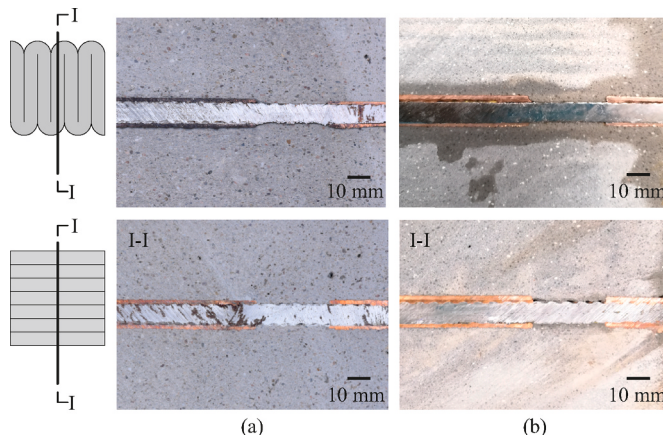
Sections through the reinforcing bar in tested specimens for both printing configurations: (a) UniNa; (b) ETHZ.
